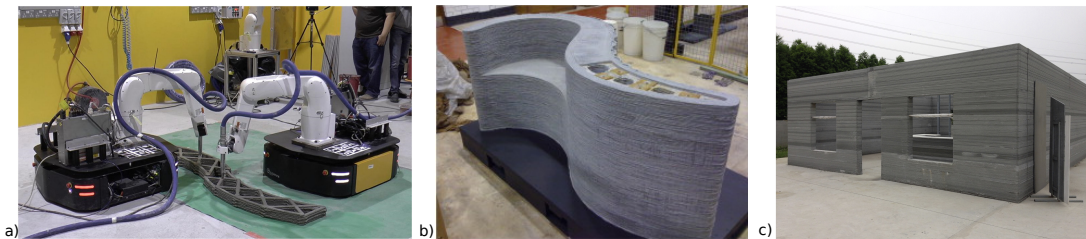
a) The use of two mobile robots in construction of a 3D printed concrete structure [14] b) A structural component built entirely via concrete printing in [11] c) A villa suit printed by WinSun through concrete printing additive manufacturing [15].
